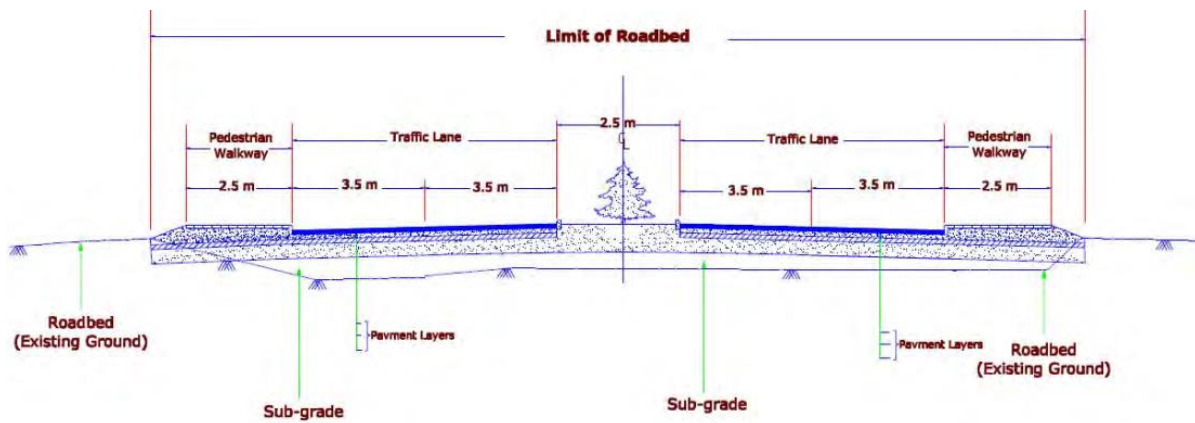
Divided Two Lane (Zonal Seat) Typical Town Section
